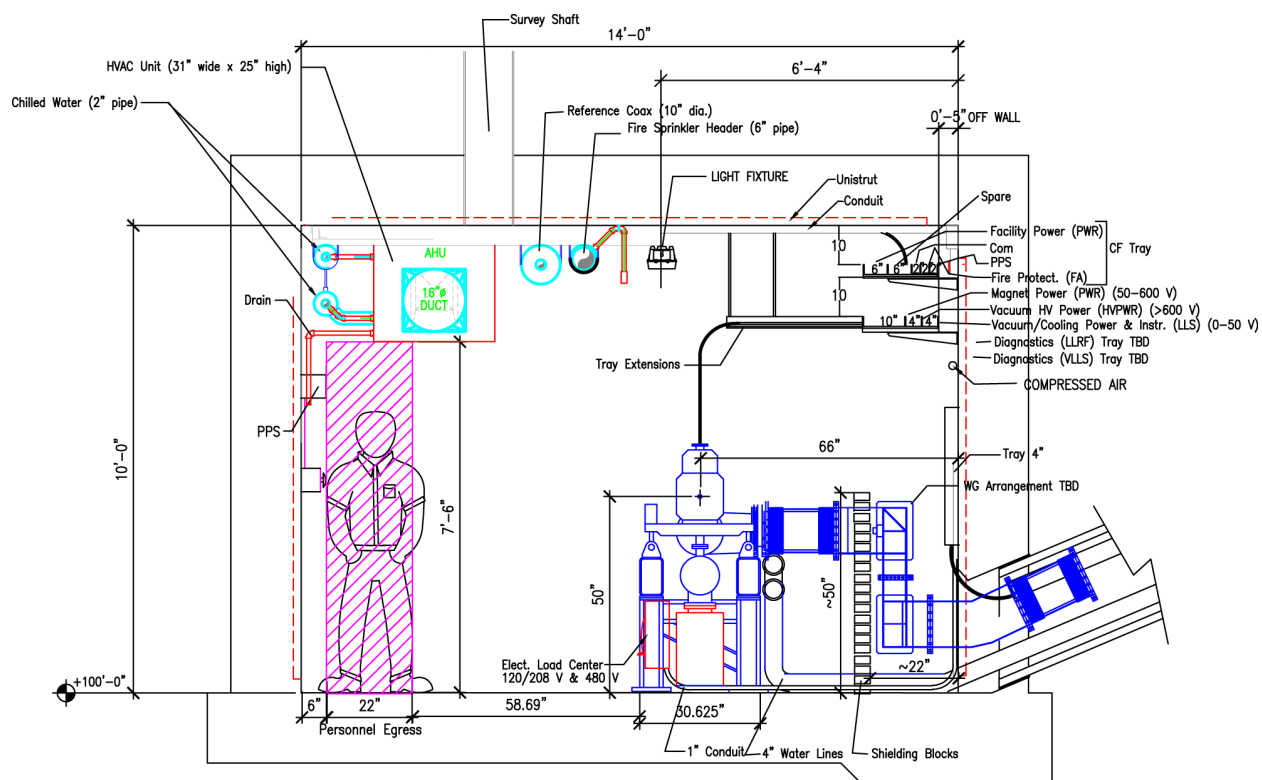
Coupled-cavity linac tunnel cross section (schematic illustration).
